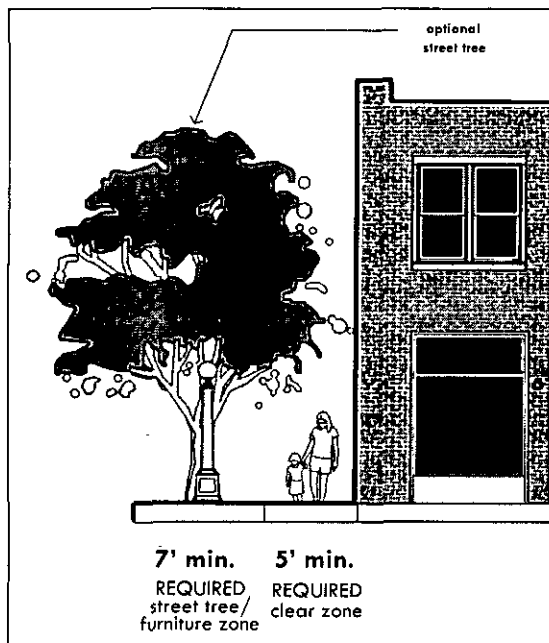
Urban roadway sidewalk width requirements. Note that street trees are optional on urban roadways.
